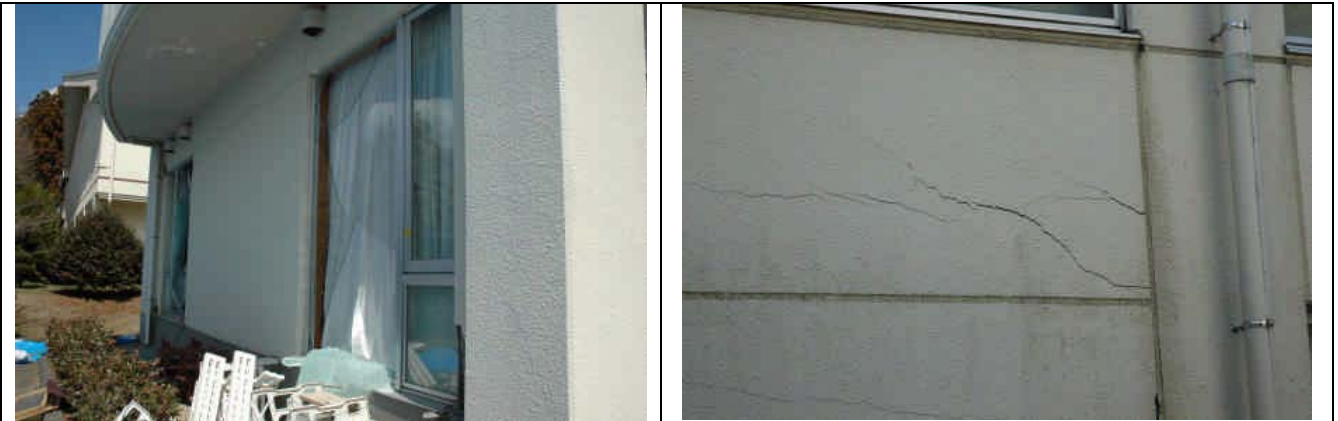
Breakage of glasses and horizontal cracks in the girder
